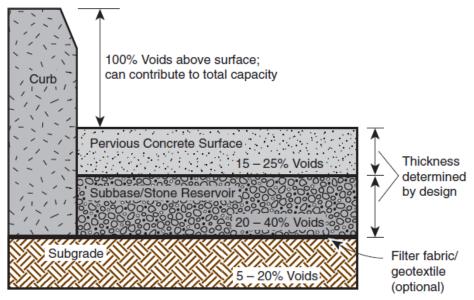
Typical cross-section of pervious concrete pavement [1]. On level subgrades, stormwater storage is provided in the pervious concrete surface layer (15% to 25% voids), the subbase (20% to 40% voids), and above the surface to the height of the curb (100% voids).
